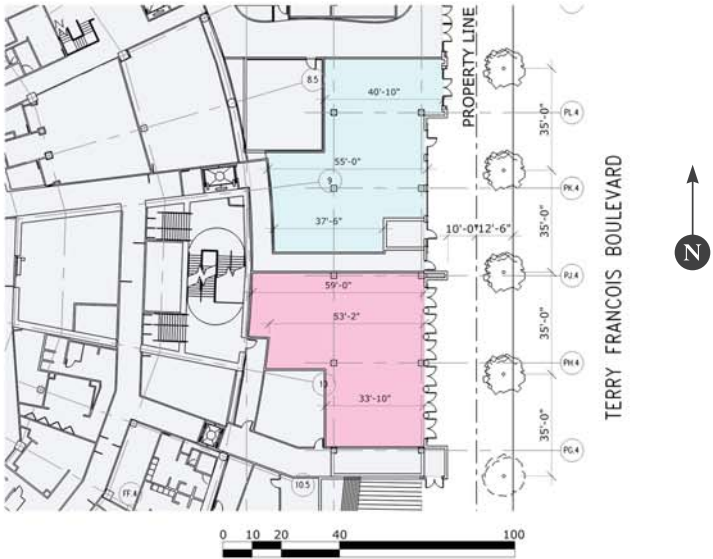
| TERRY A FRANCOIS BOULEVARD RETAIL LEVEL 050 PLAN
